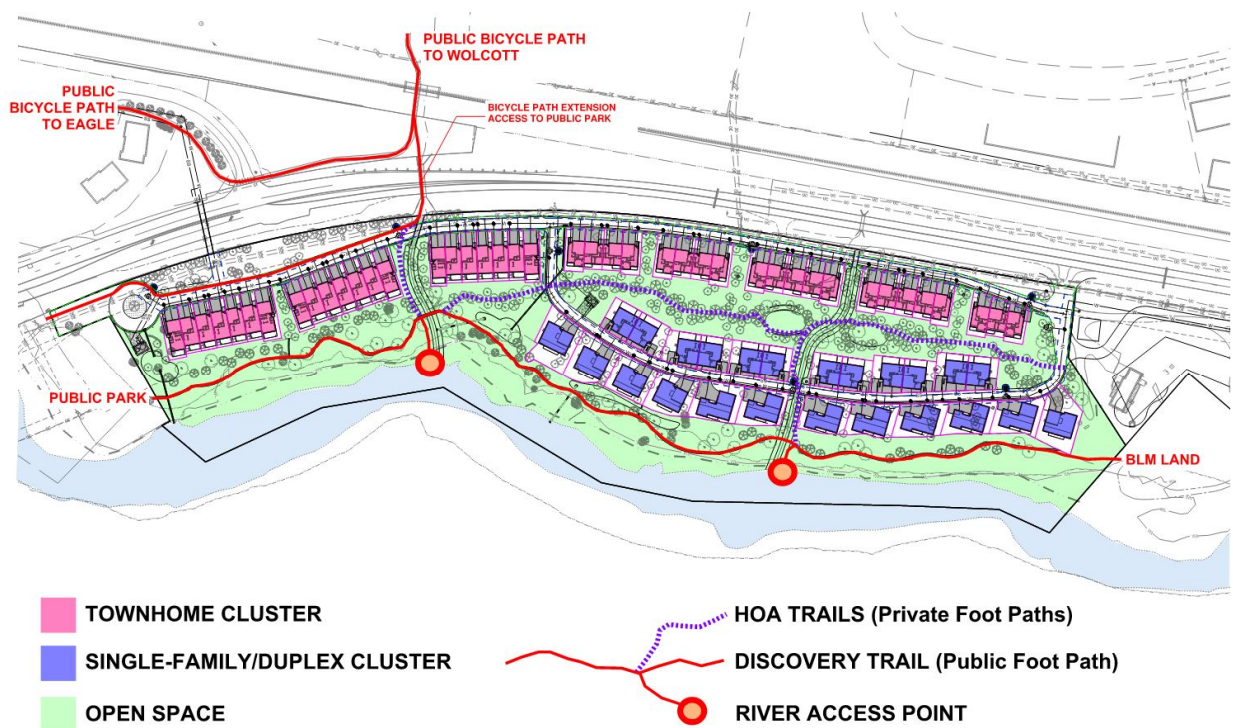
Site Plan – Clustered Development to Maximize Open Space
